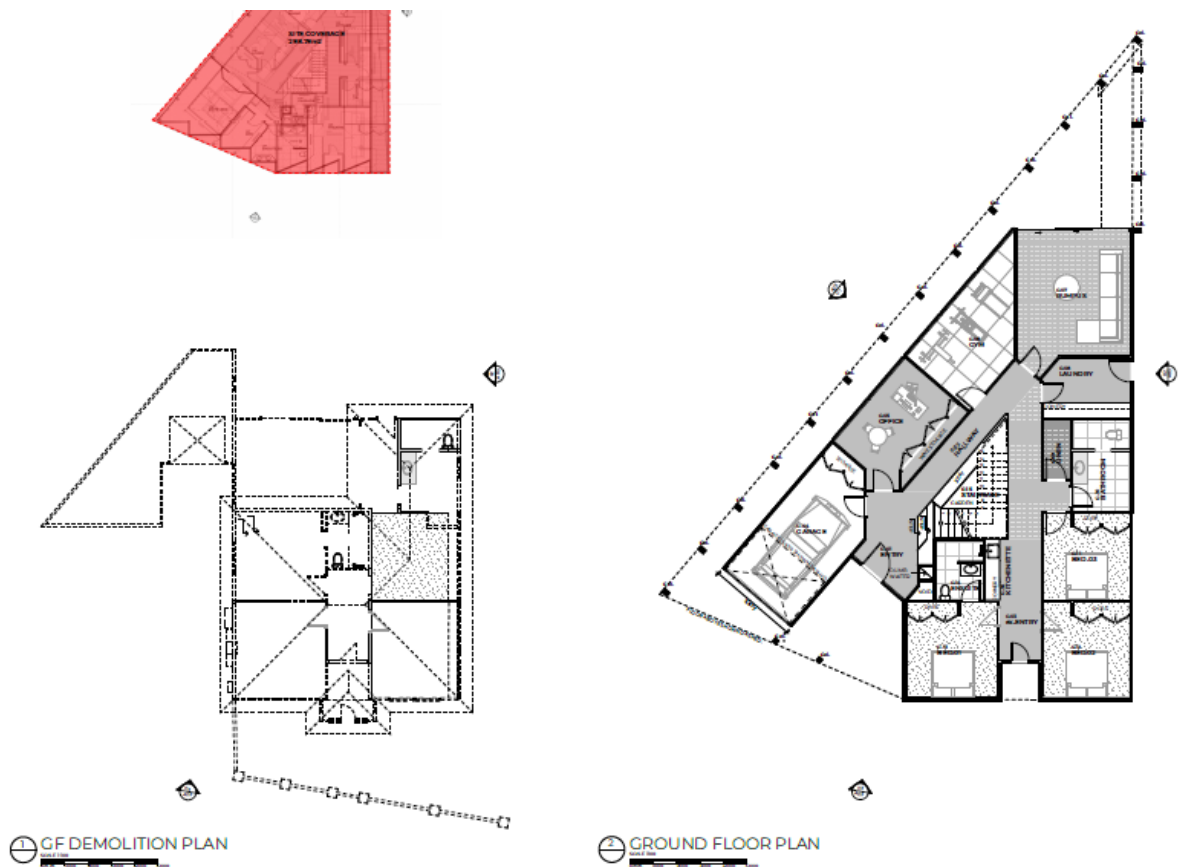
Proposal plans showing demolition plan on the left and new ground floor plan on the right
